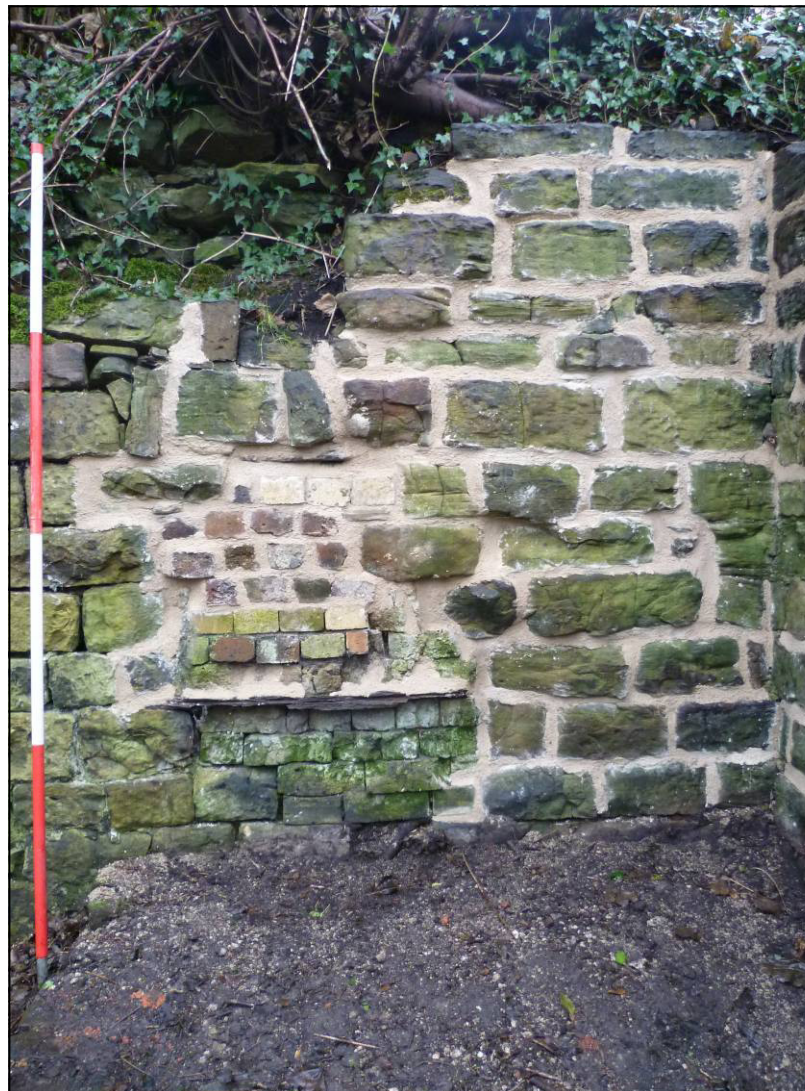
Area 3 dam wall immediately after repointing, looking S (photo 3/503).
